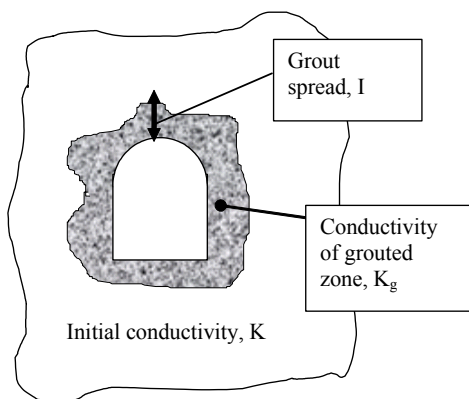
Grouted zone around a tunnel, with penetration length I , and hydraulic conductivity, K_g .
